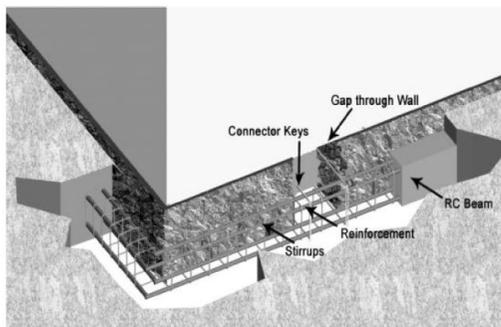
Strengthening of foundation (IIT Roorkee, 2006).
